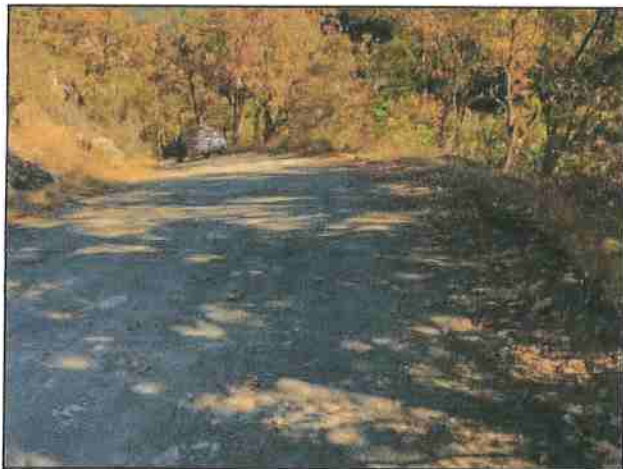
River Rd Looking SE @ Curve w/ Turnout
